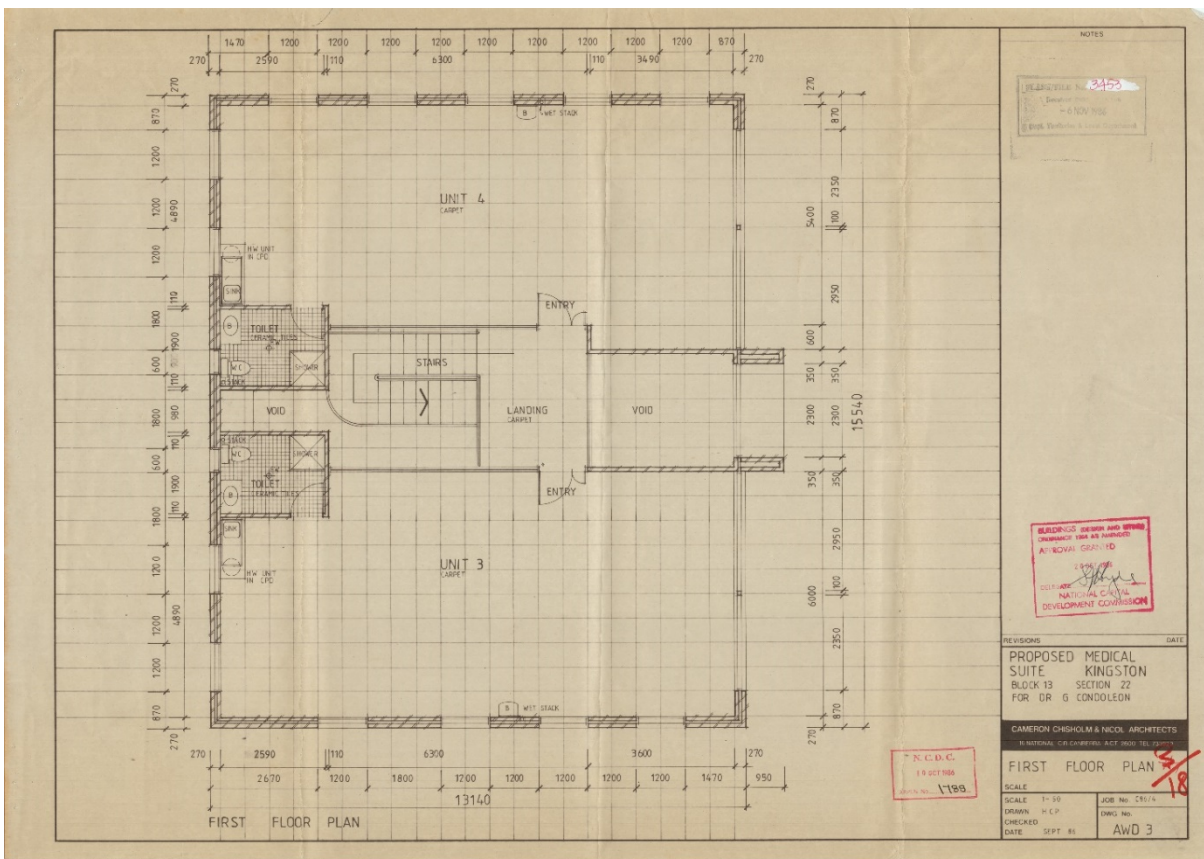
Cameron Chisholm & Nicol Architects second floor plan of Kingston Chambers, 1986.
